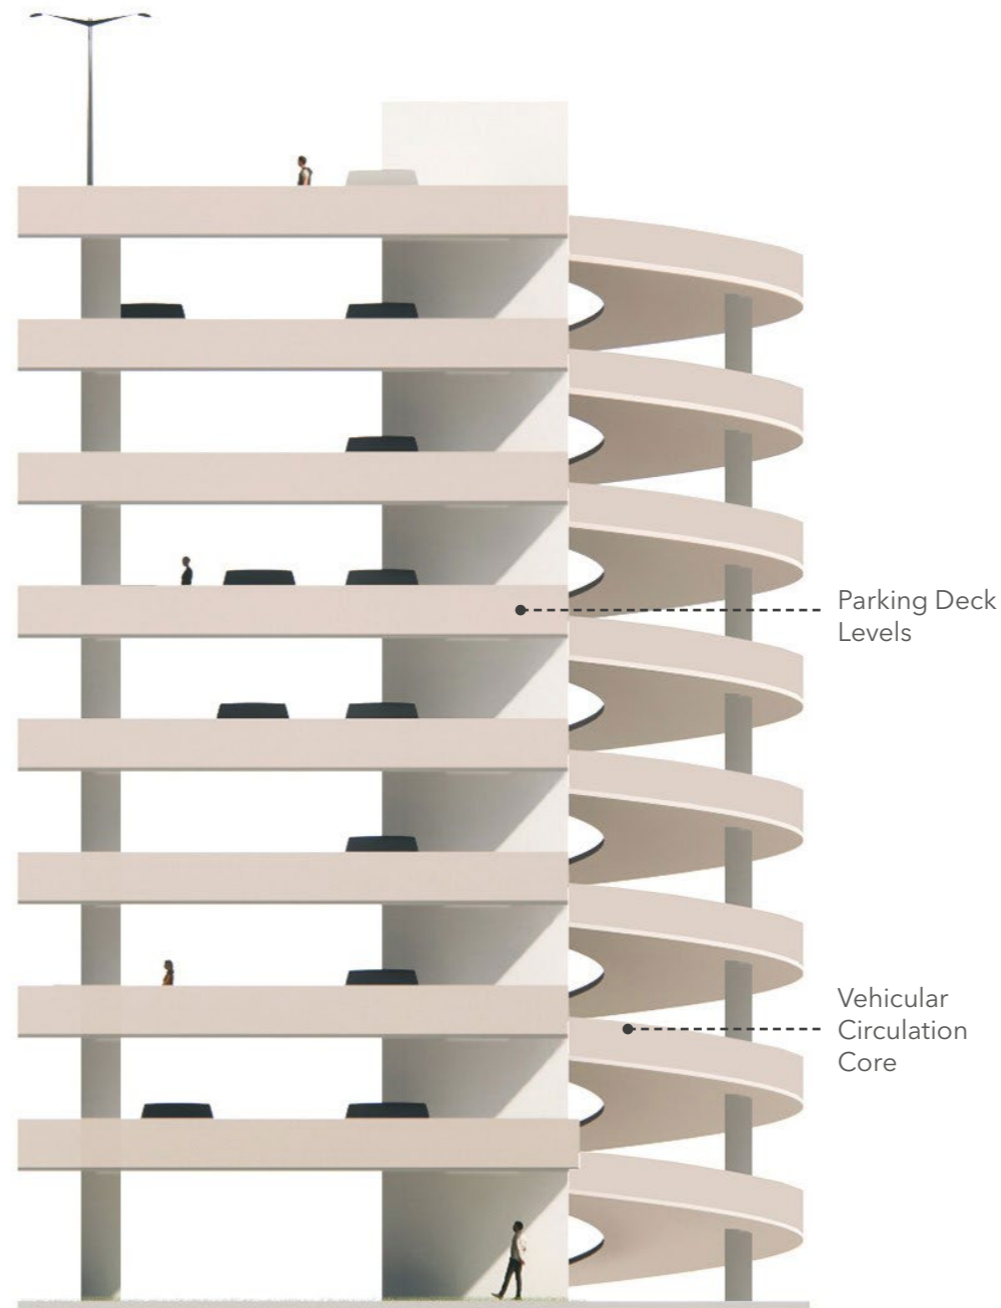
Indicative Elevation showing Typical 'MSCP Car Park' Design
